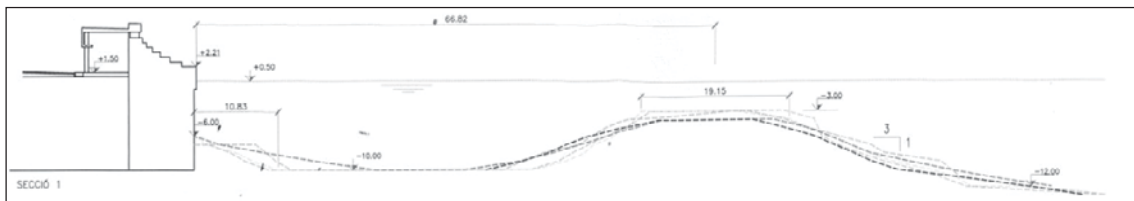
Layout of vertical seawall coupled with submerged breakwater (prototype scale)
